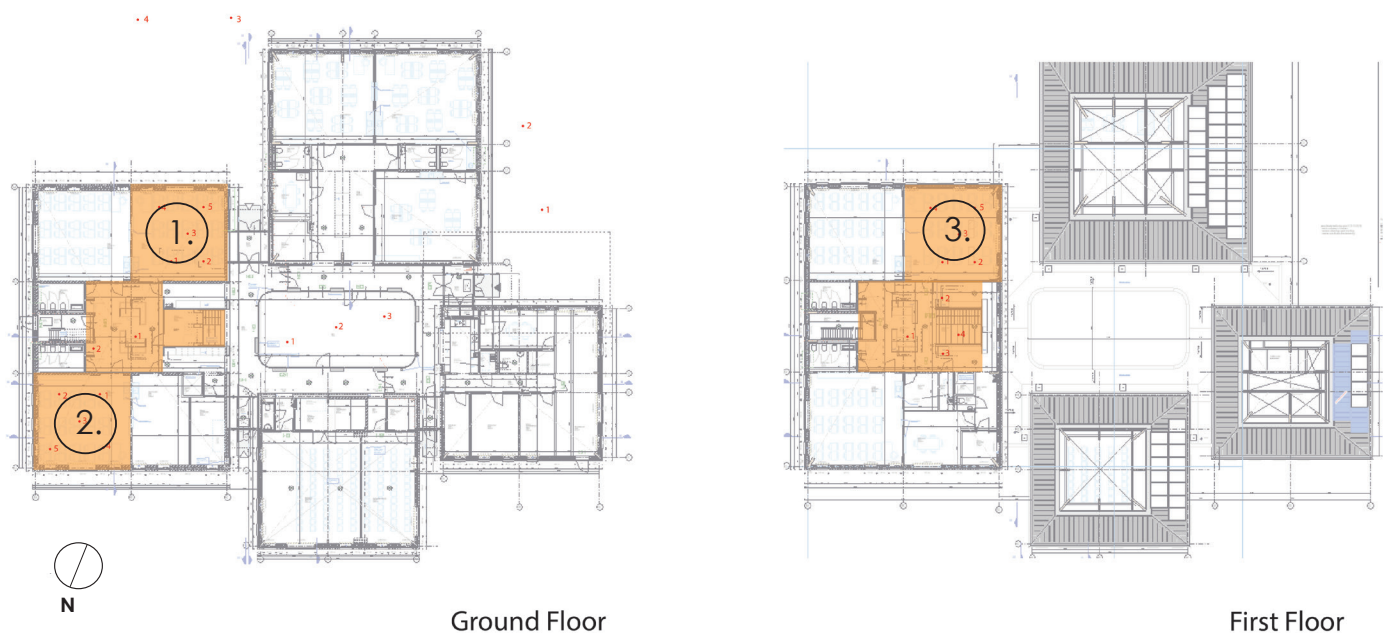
The floor plans of the Ds Abraham Hellenbroekschool
